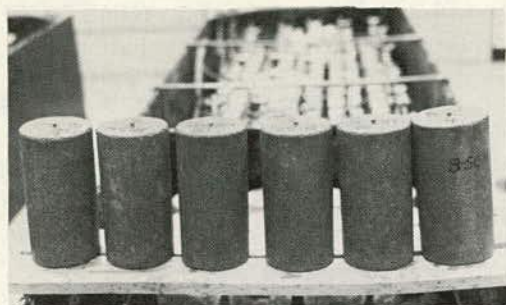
Condition of 4½-sack concrete after 4 cycles of alternate immersion in sodium chloride and oven-drying.
